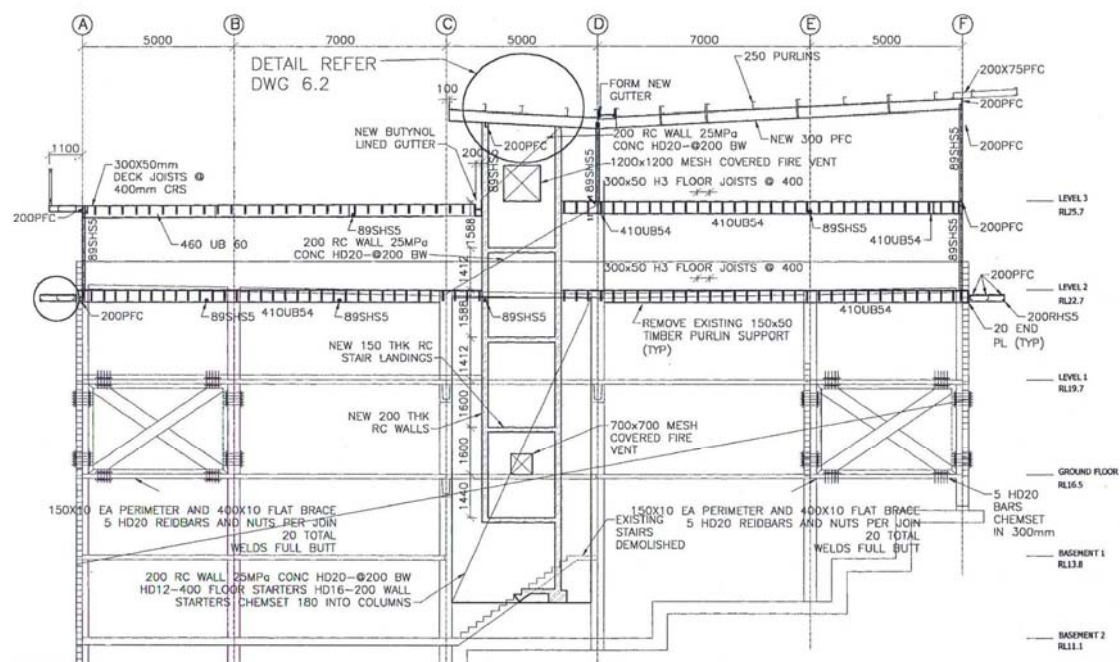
Section through the building taken from structural documentation (fire ratings not shown)
